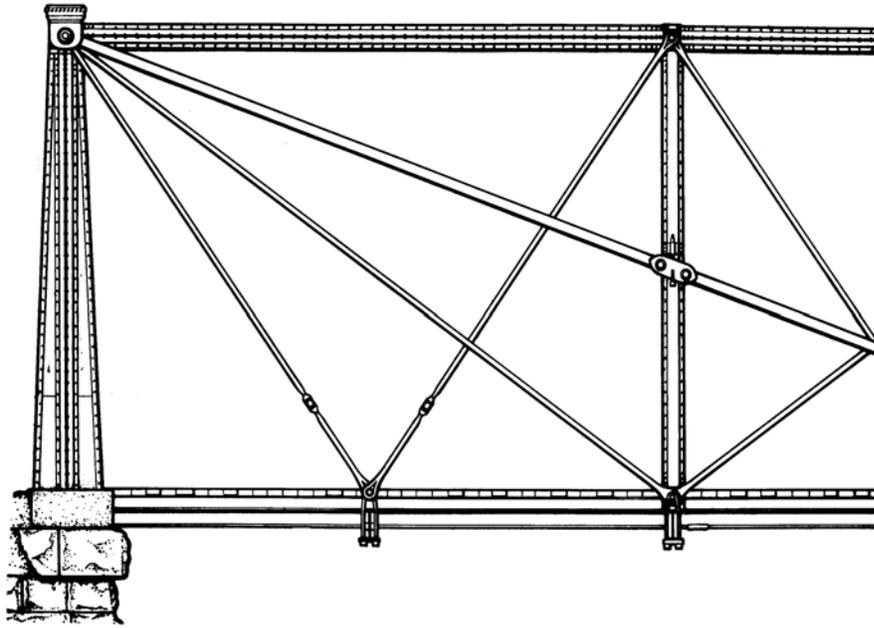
Elevation of a truss-like structure. Zoarville Station Bridge, Zoarville, Ohio (HAER).
